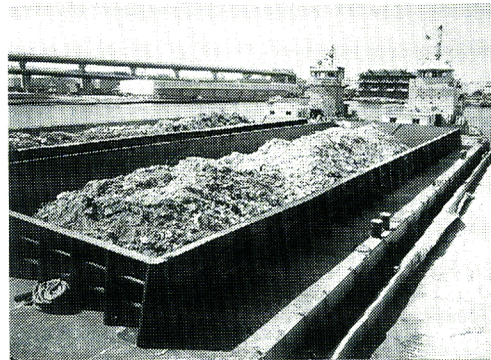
Concrete and brick blocks under shipment from the base on Kobe's Nadahama.
